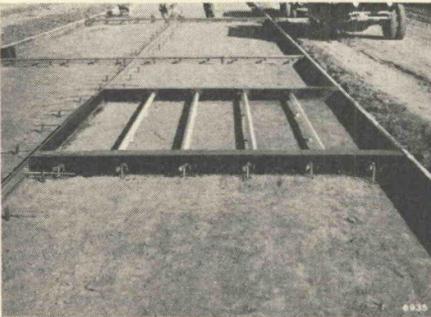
Subgrade Prepared for Construction of a Special Test Section
